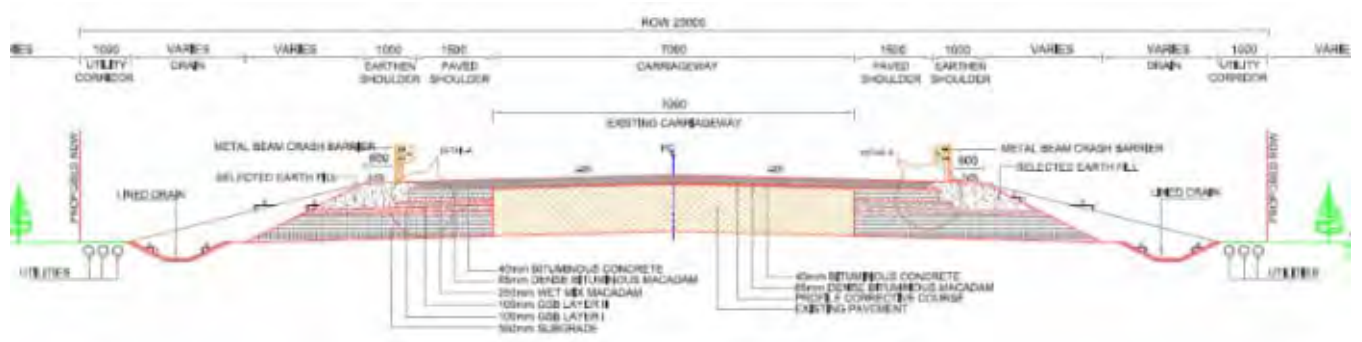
C4-R – O Two Lane Carriageway with Paved Shoulder in Rural Area (Overlay)
